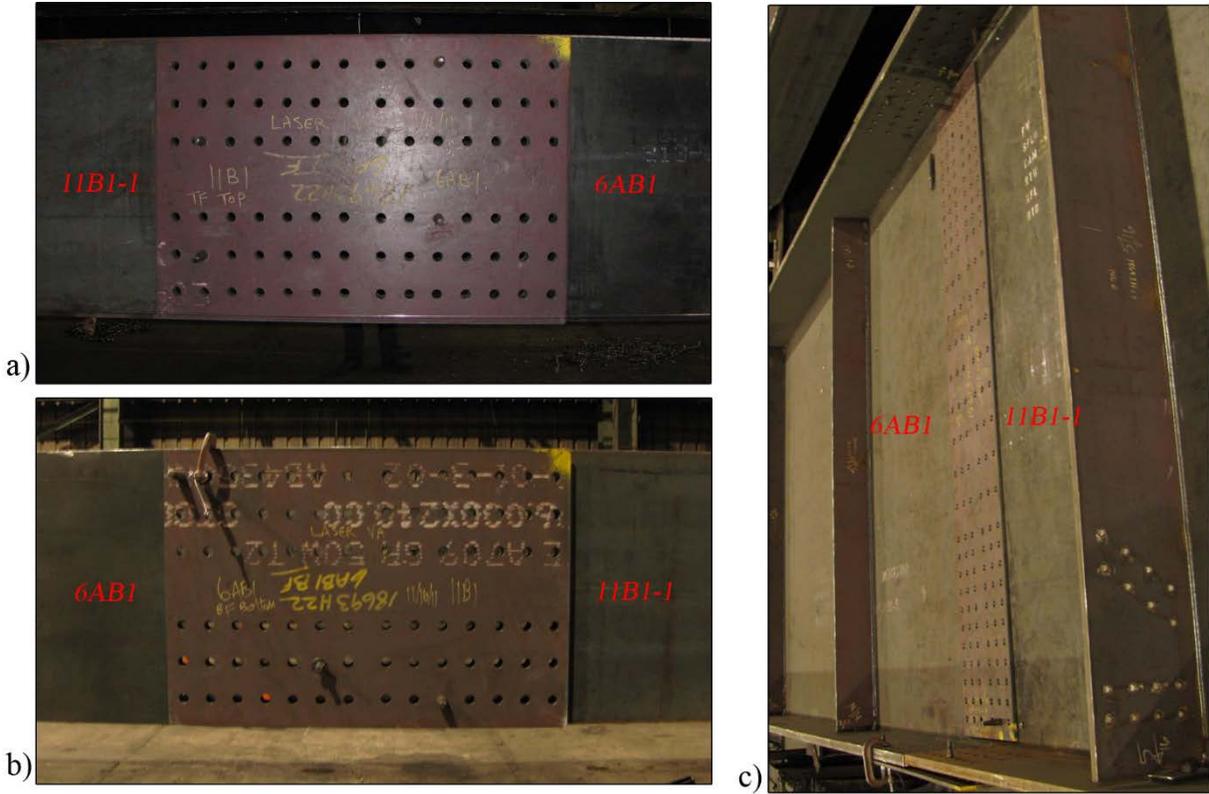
BRIDGE VAS Detailed Splice Plates Fit-Up in Girder Laydown Showing a) Top Flange, b) Bottom Flange, and c) Web Plates
